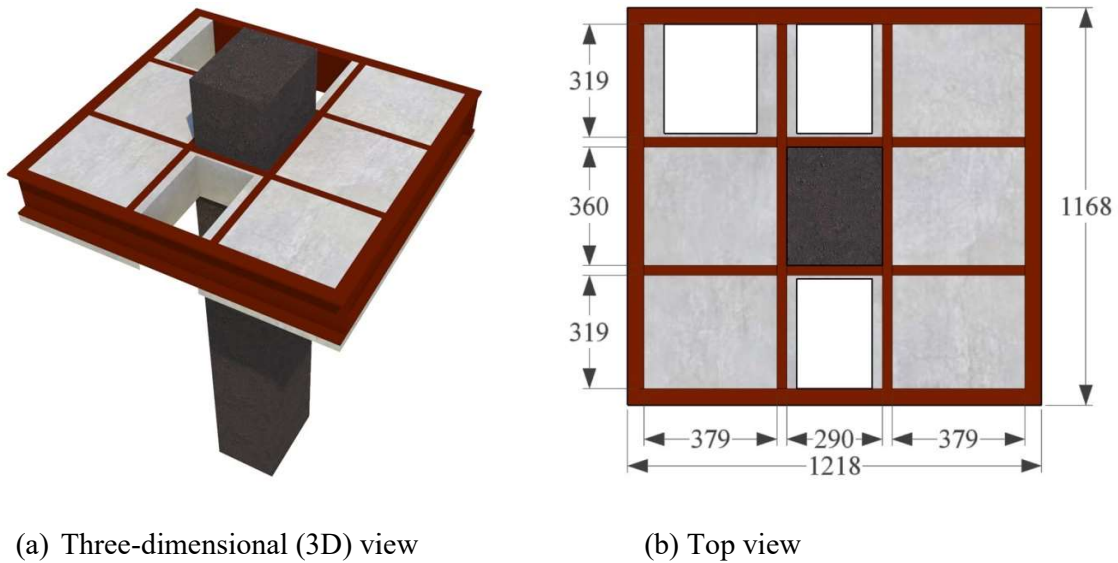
Construction concept of a typical column-slab connection strengthened by steel profiles (Units: mm. Note: There are openings in the slab)
